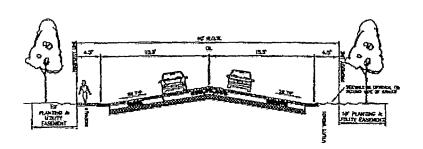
LOCAL RESIDENTIAL & COLLECTOR STREET STANDARDS MILLERTON SPECIFIC PLAN
